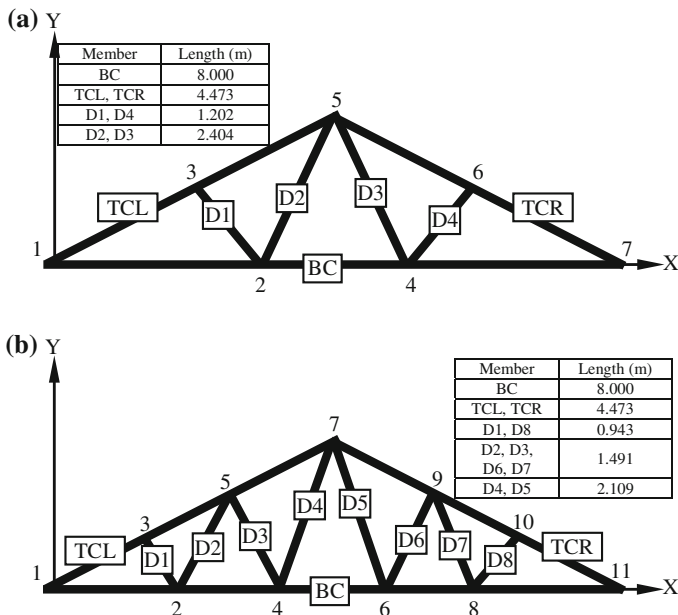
Truss configurations: a Fink truss, and b double fink truss
